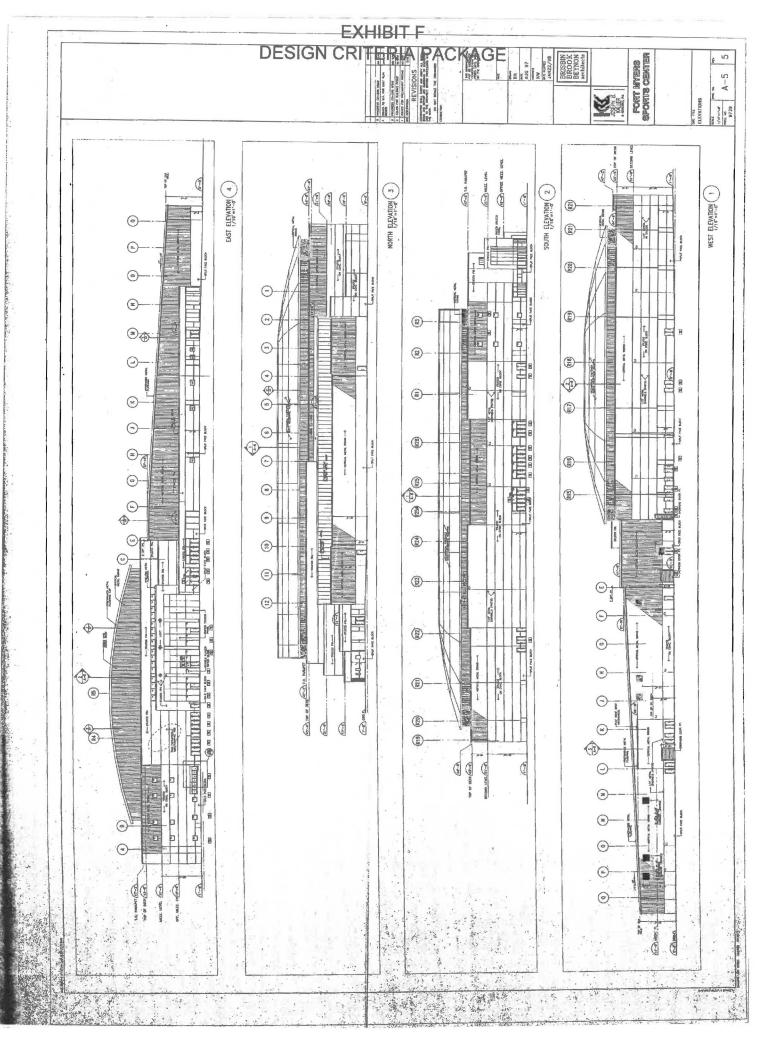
EXISTING ARCHITECTURAL DRAWINGS
